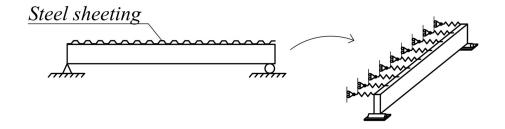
Continuous bracing of a beam by decking (with use of a corrugated steel sheet).
